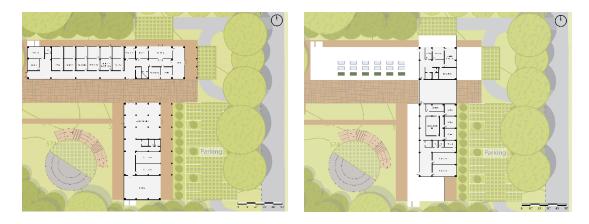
A: Level 1 Floor Plan; Figure 34B: Level 2 Floor Plan
